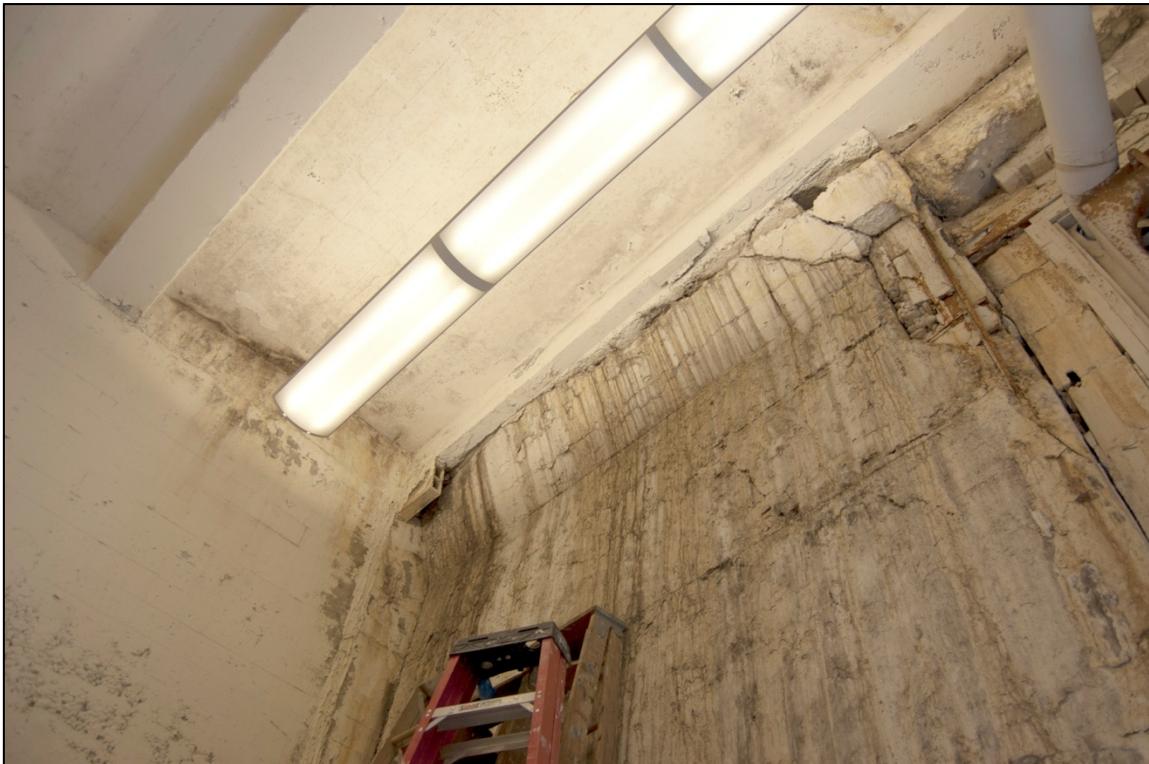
South end of west abutment from inside the Prefontaine Building areaway, view to the northeast.
